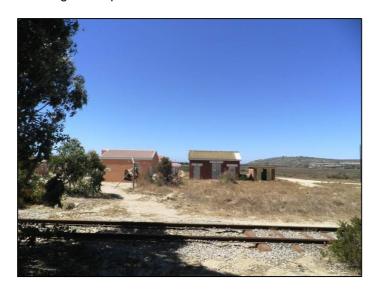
Existing vibracrete wall that has been vandalised and stolen.
